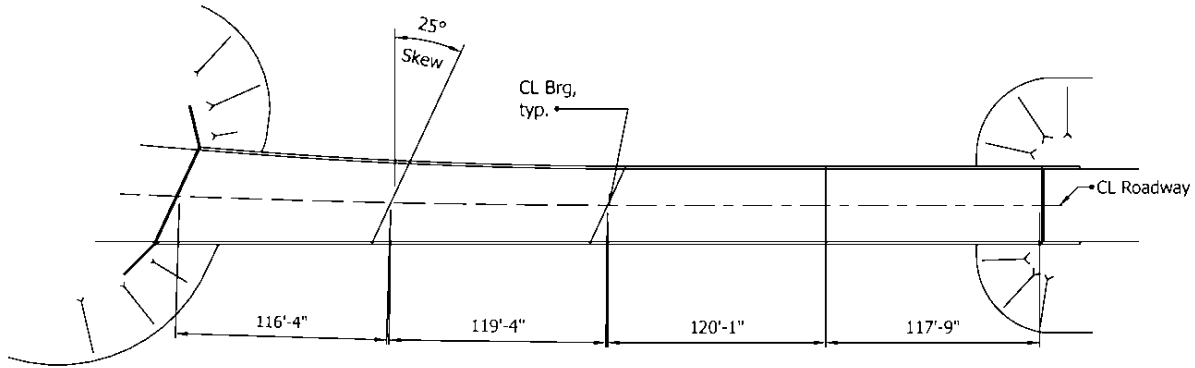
Plan view of a four-span bridge with variable skews (Example 1)
